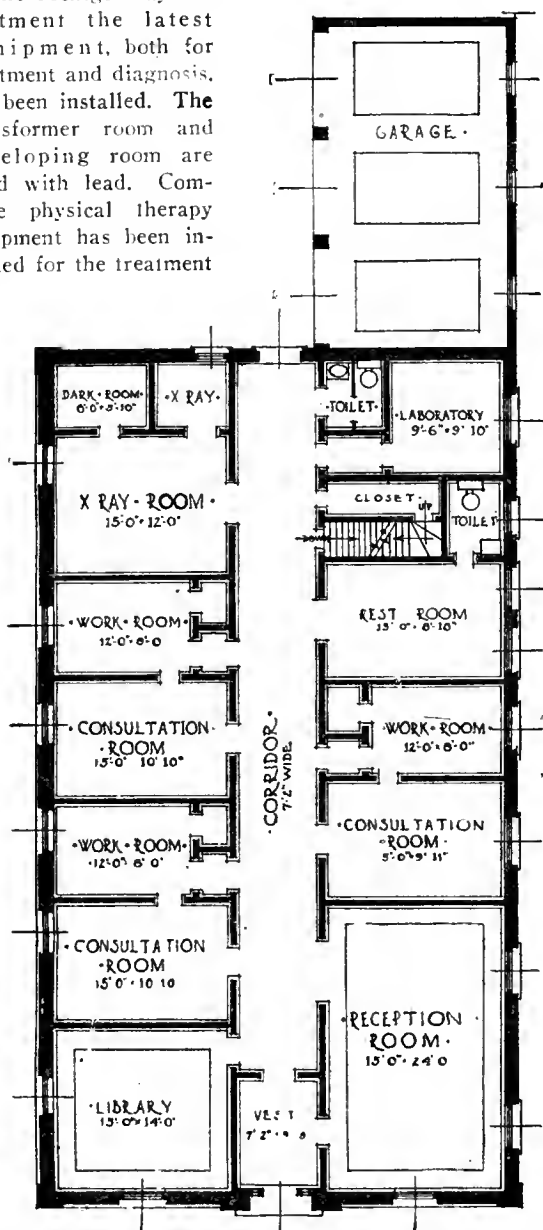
First floor plan, 40 by 72 feet, including garage.
